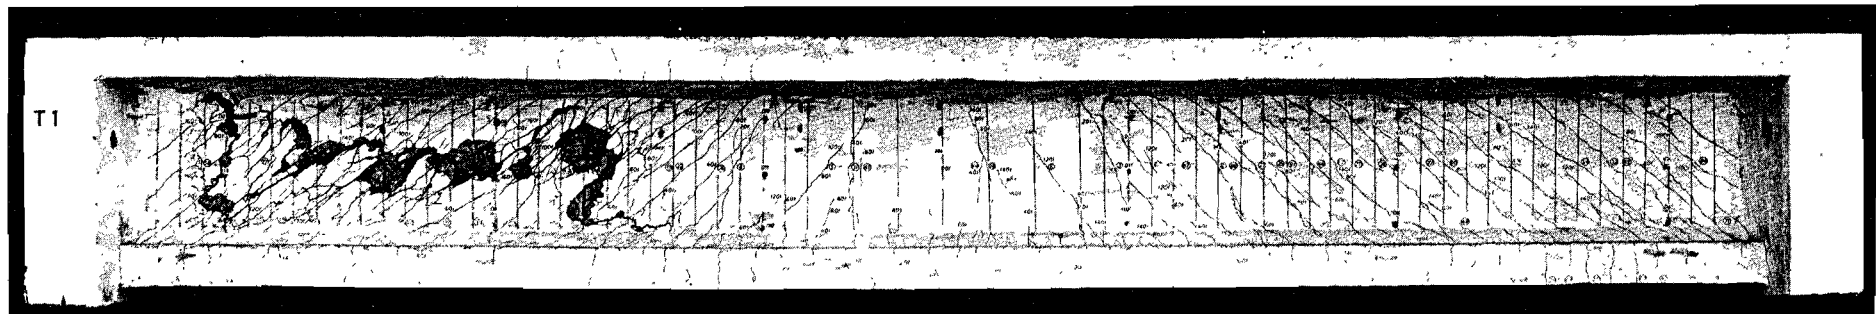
Cracking pattern of beam T1 after shear failure in web; ribbed stirrups on the left, plain ones on the right.
